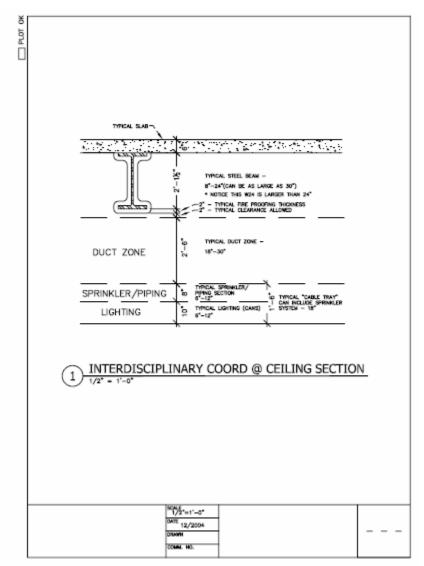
Typical Interdisciplinary Coordination and Ceiling Section Detail on Drawings
